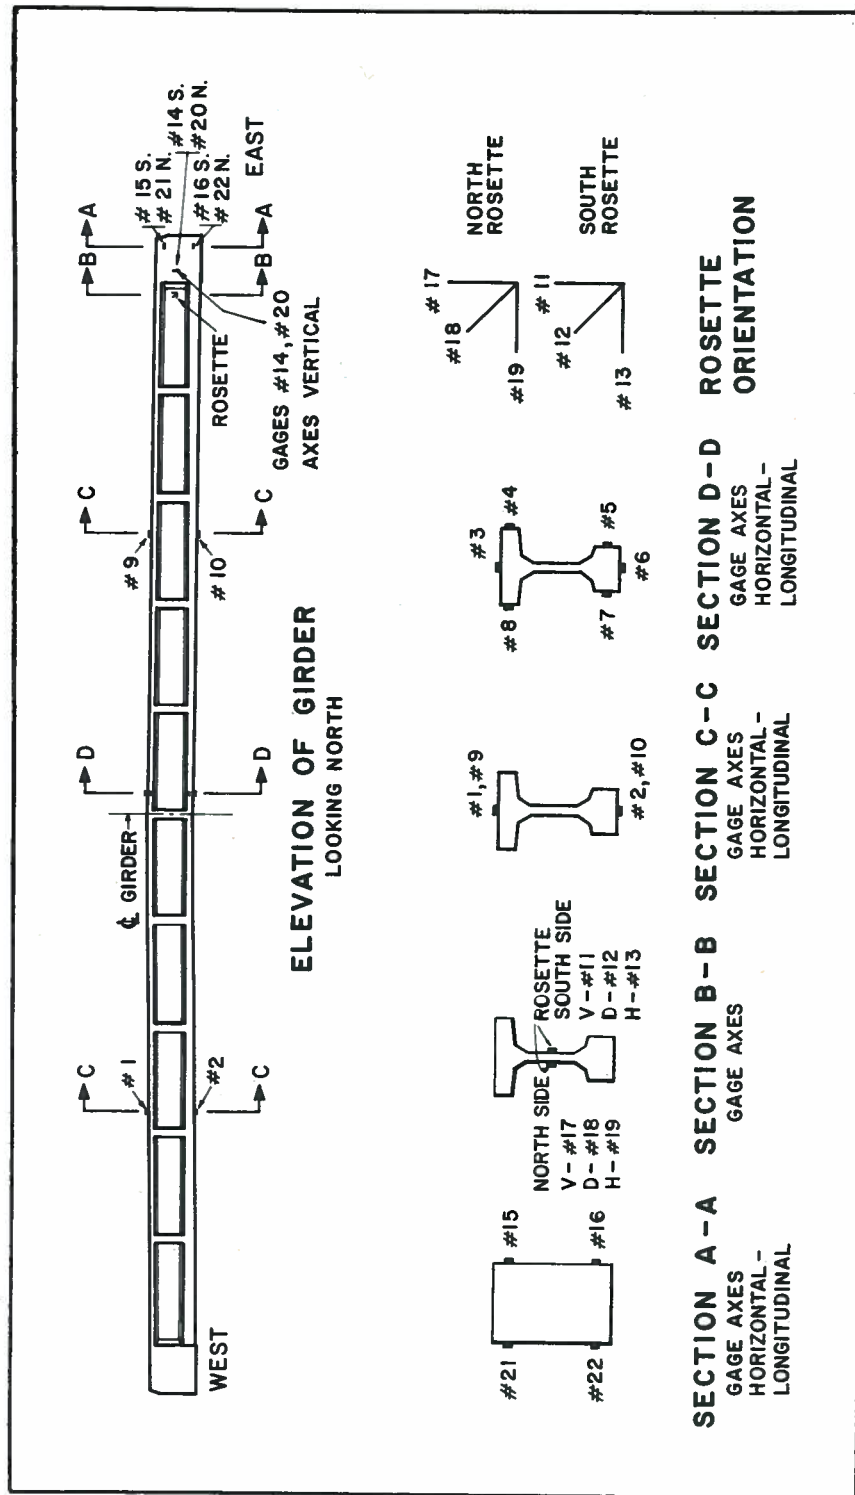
Elevation of Walnut Lane test girder showing location of electric strain gages.
